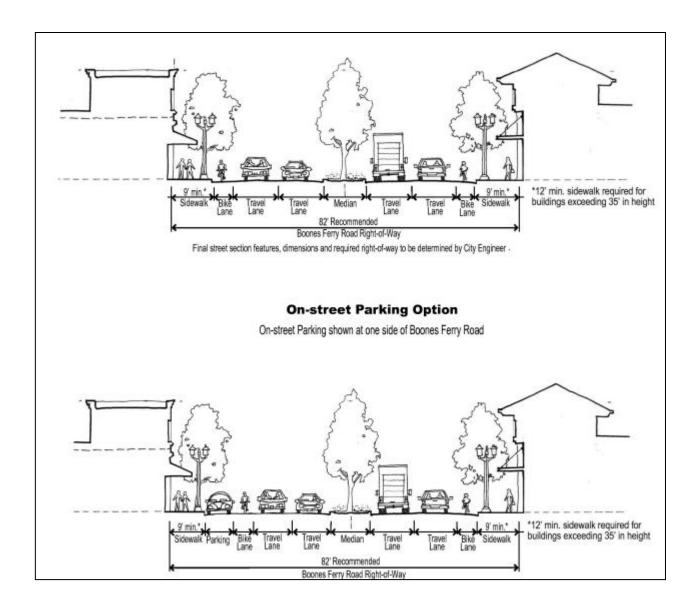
Y: Boones Ferry Typical Mid-Block Street Section
